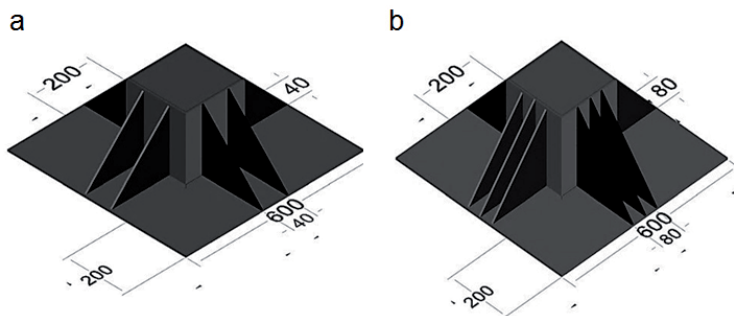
Details of steel plate and stiffeners (all dimensions in mm): a – plate with two stiffeners; b – plate with three stiffeners
